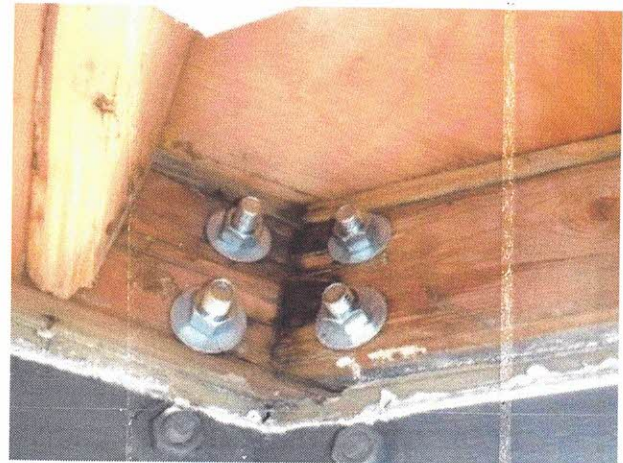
Staining around bolts connecting balcony to column. (Unit 201)
